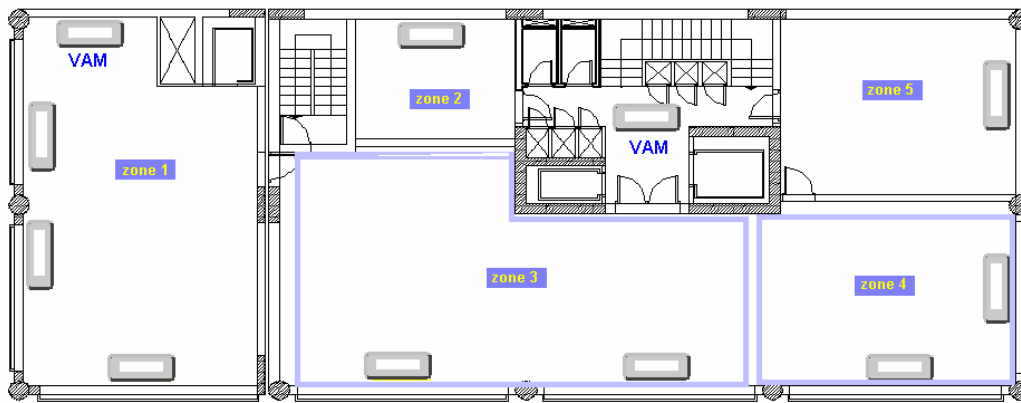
3<sup>rd</sup> Floor and thermal zones plan of BYTE
